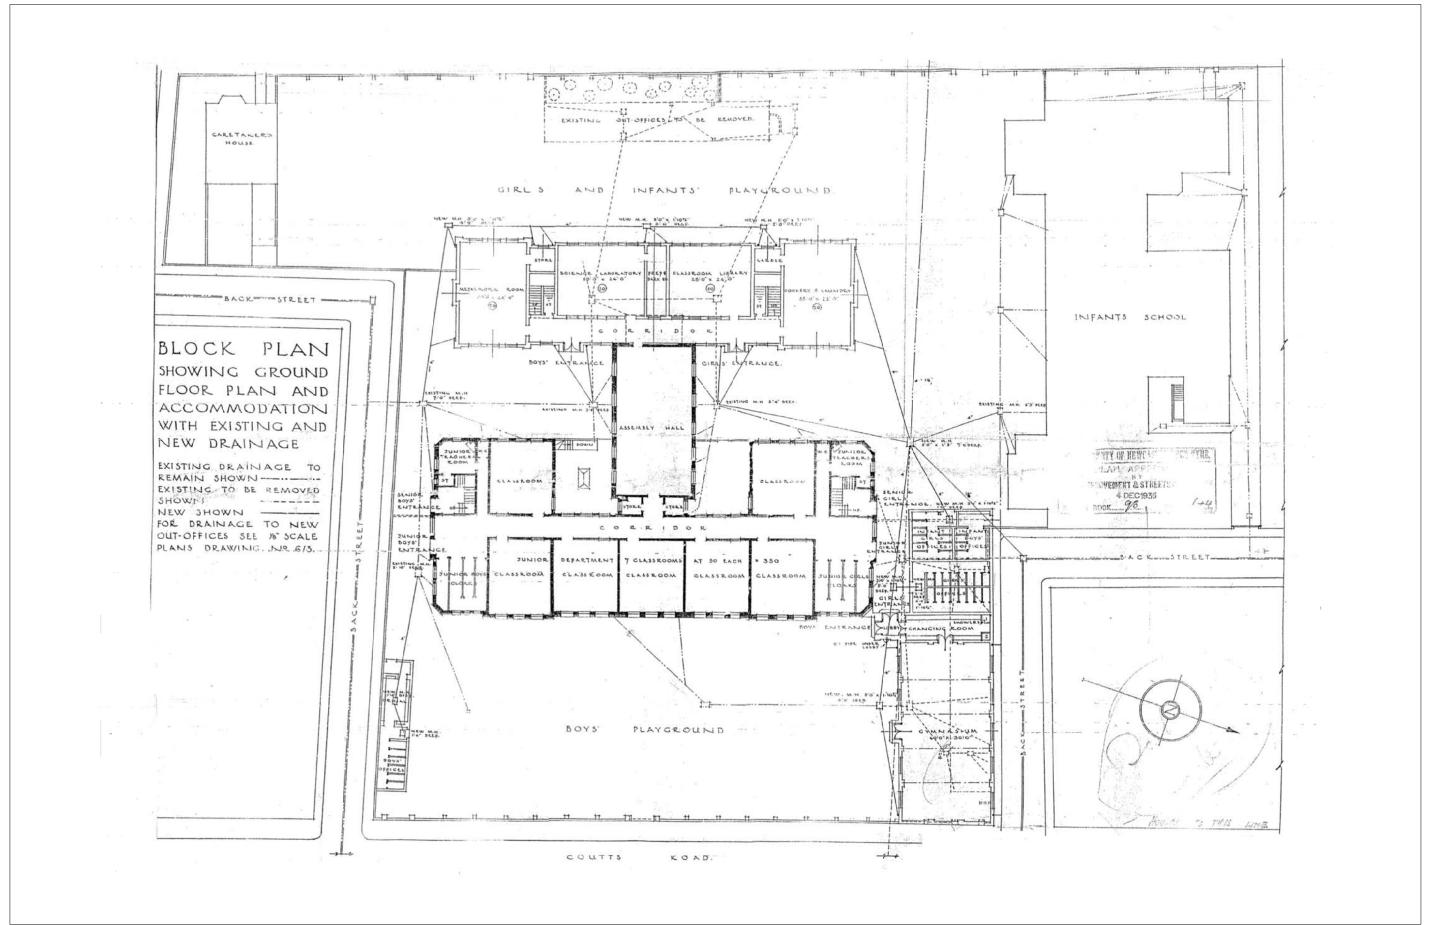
Block Plan showing Ground Floor Plan and accommodation with existing and new drainage. Walker Gate School, Alterations and Additions
